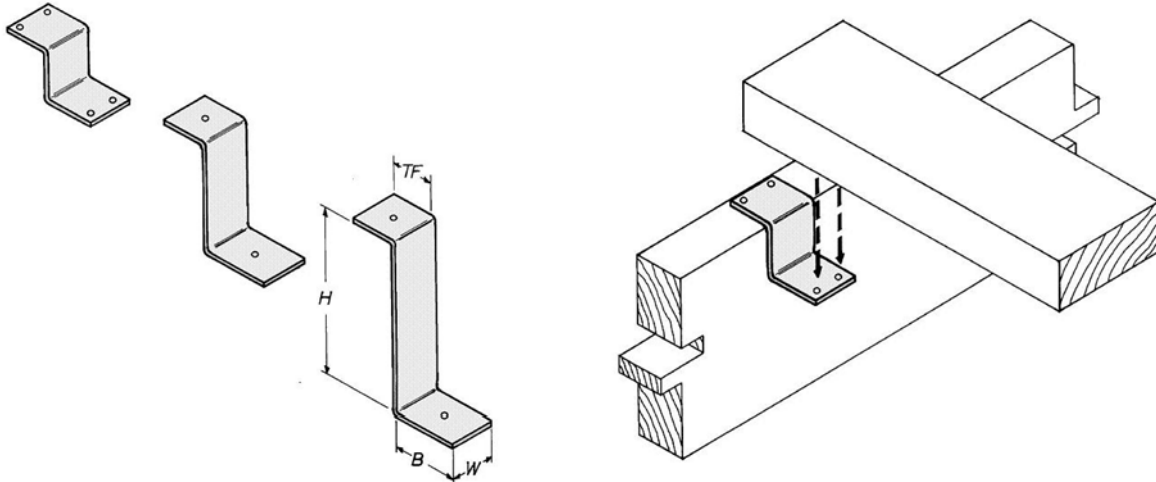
TYPICAL TZ SERIES HANGERS AND A TYPICAL INSTALLATION DETAIL
